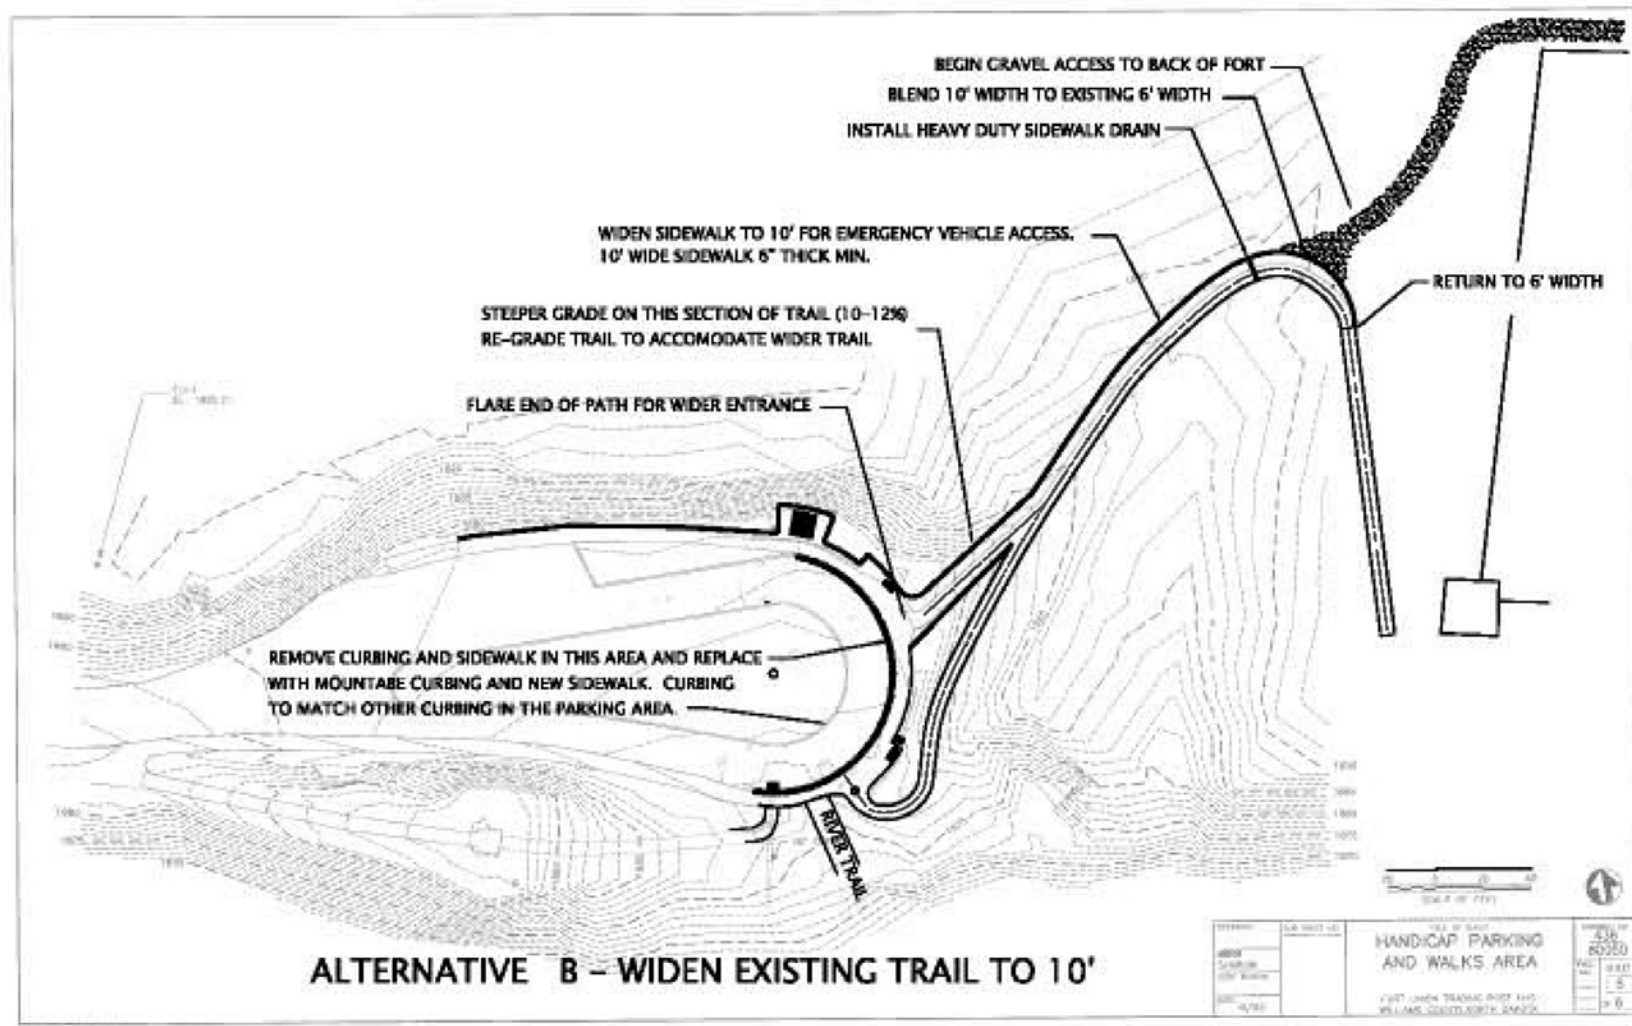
Draft Engineering plan for construction of emergency vehicle access route to reconstructed Fort Union.
